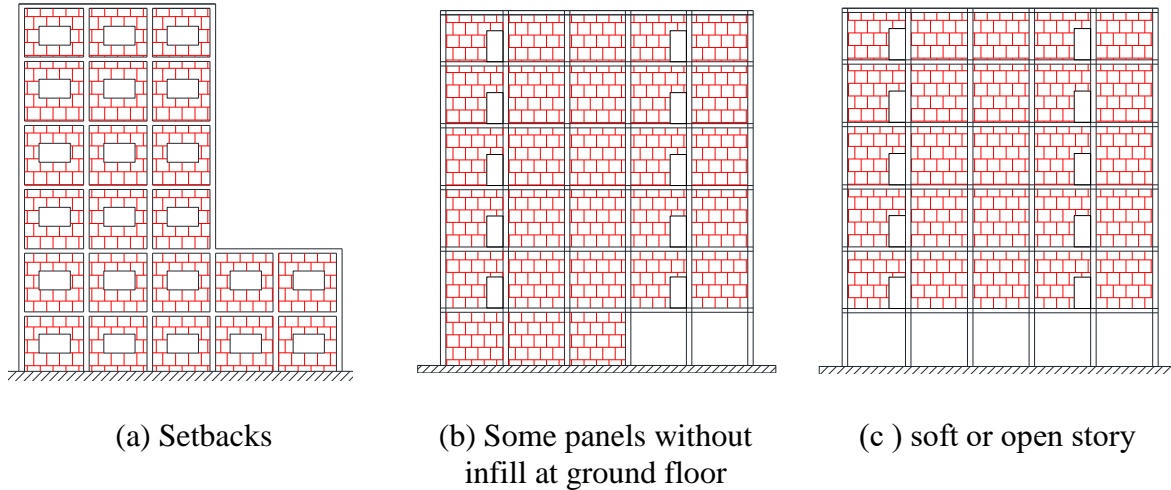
Elevation view of some typical RC frame having vertical irregularities
